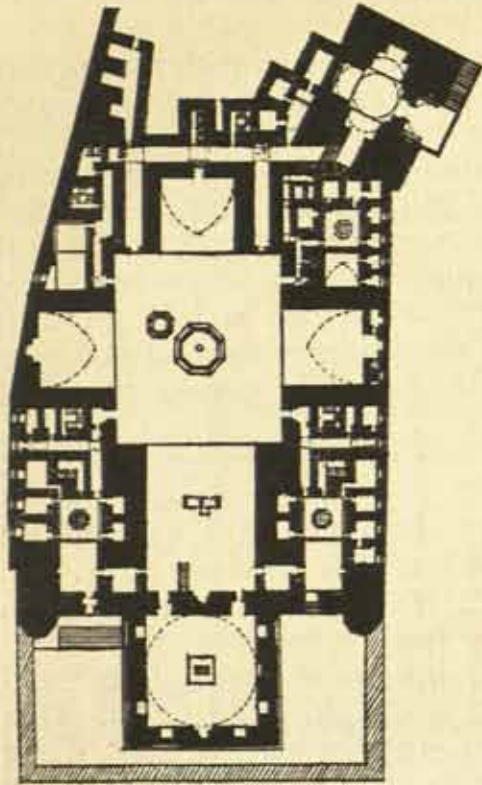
CAIRO: MADRASAH OF SULTAN ḤASAN. PLAN
